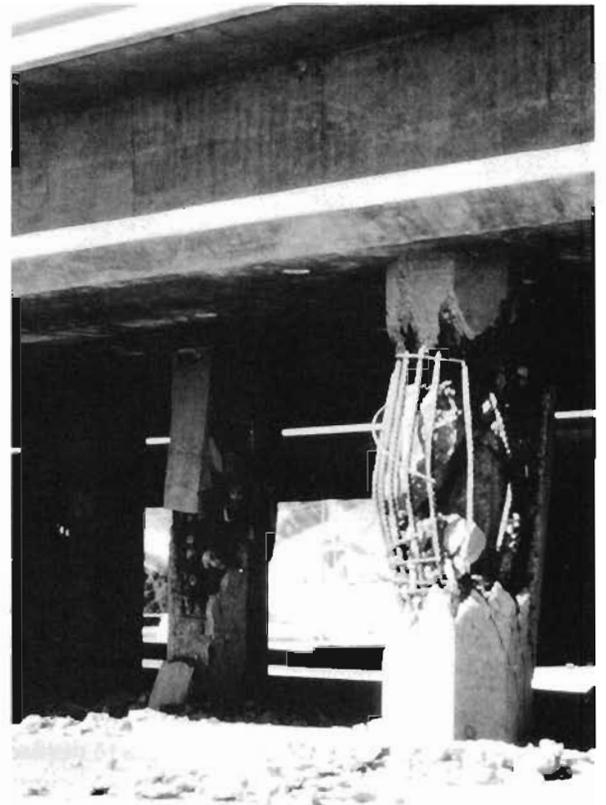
Many bridge columns constructed of reinforced concrete failed during the 1971 San Fernando earthquake because of a lack of ductility.
